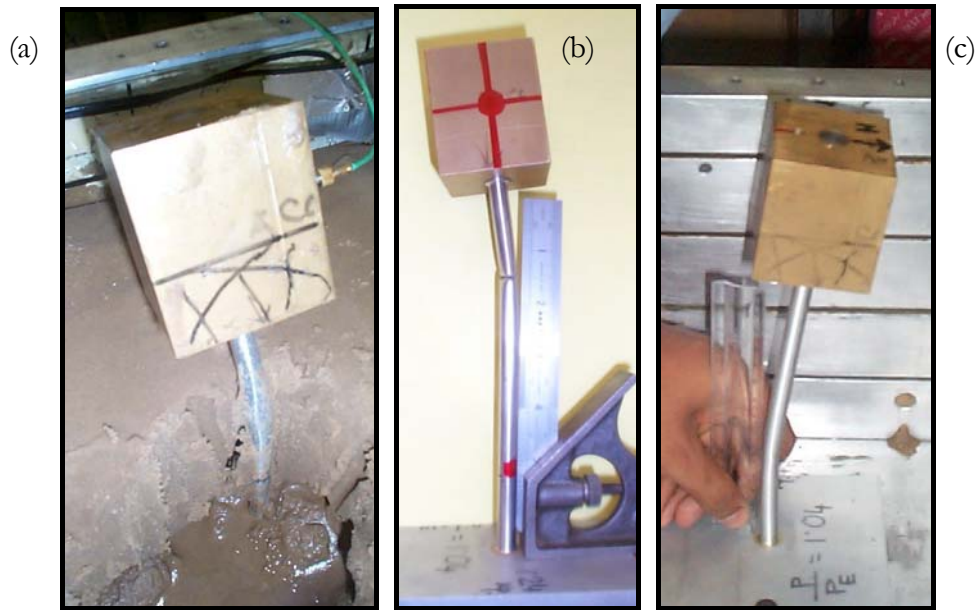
(a) Mode of failure of pile 7 in test SB-04 during excavation; (b): Pile 7 after excavation in test SB-04; (c): Same pile in test SB-05.
